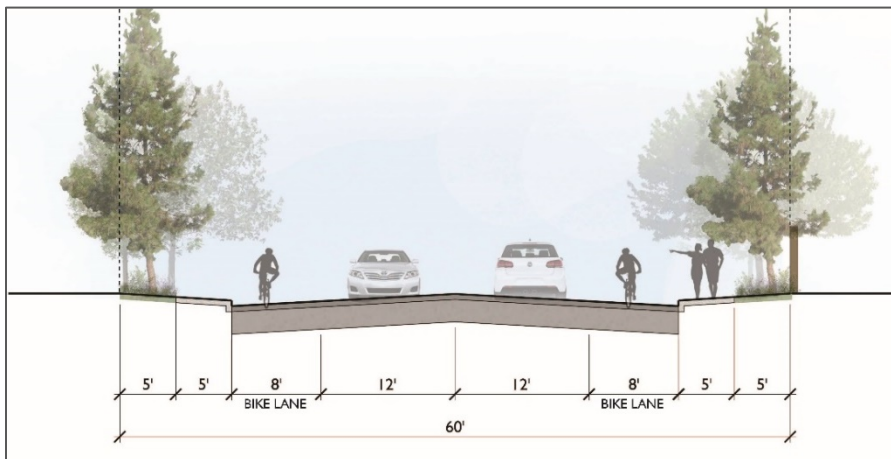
Local Street Cross-Section (Wallace Street & 34<sup>th</sup> Street<sup>1</sup>)
